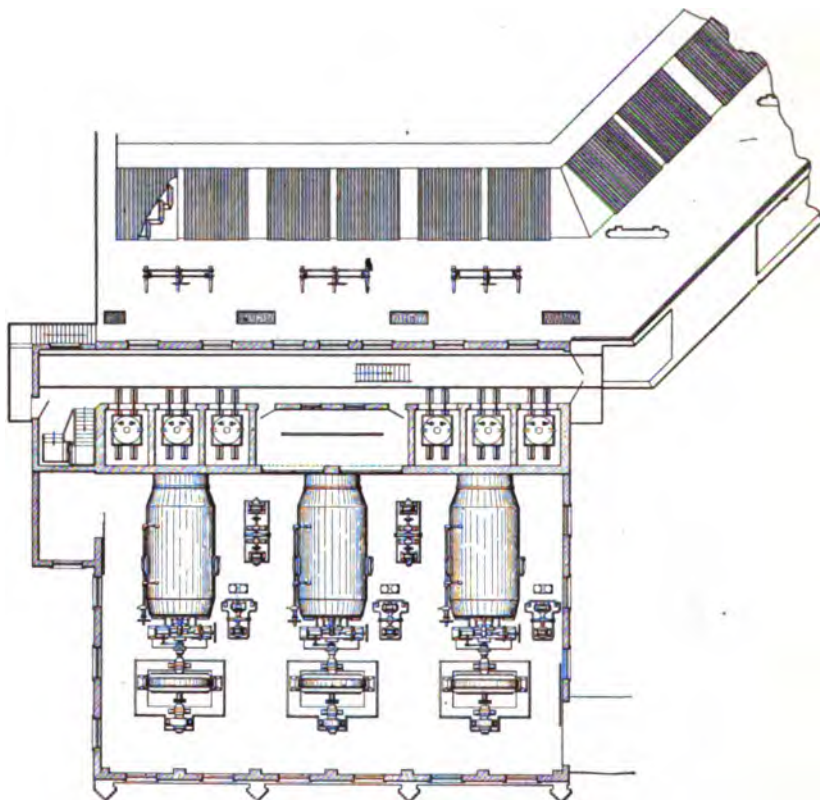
SECTIONAL PLAN, TWIN FALLS PLANT.
